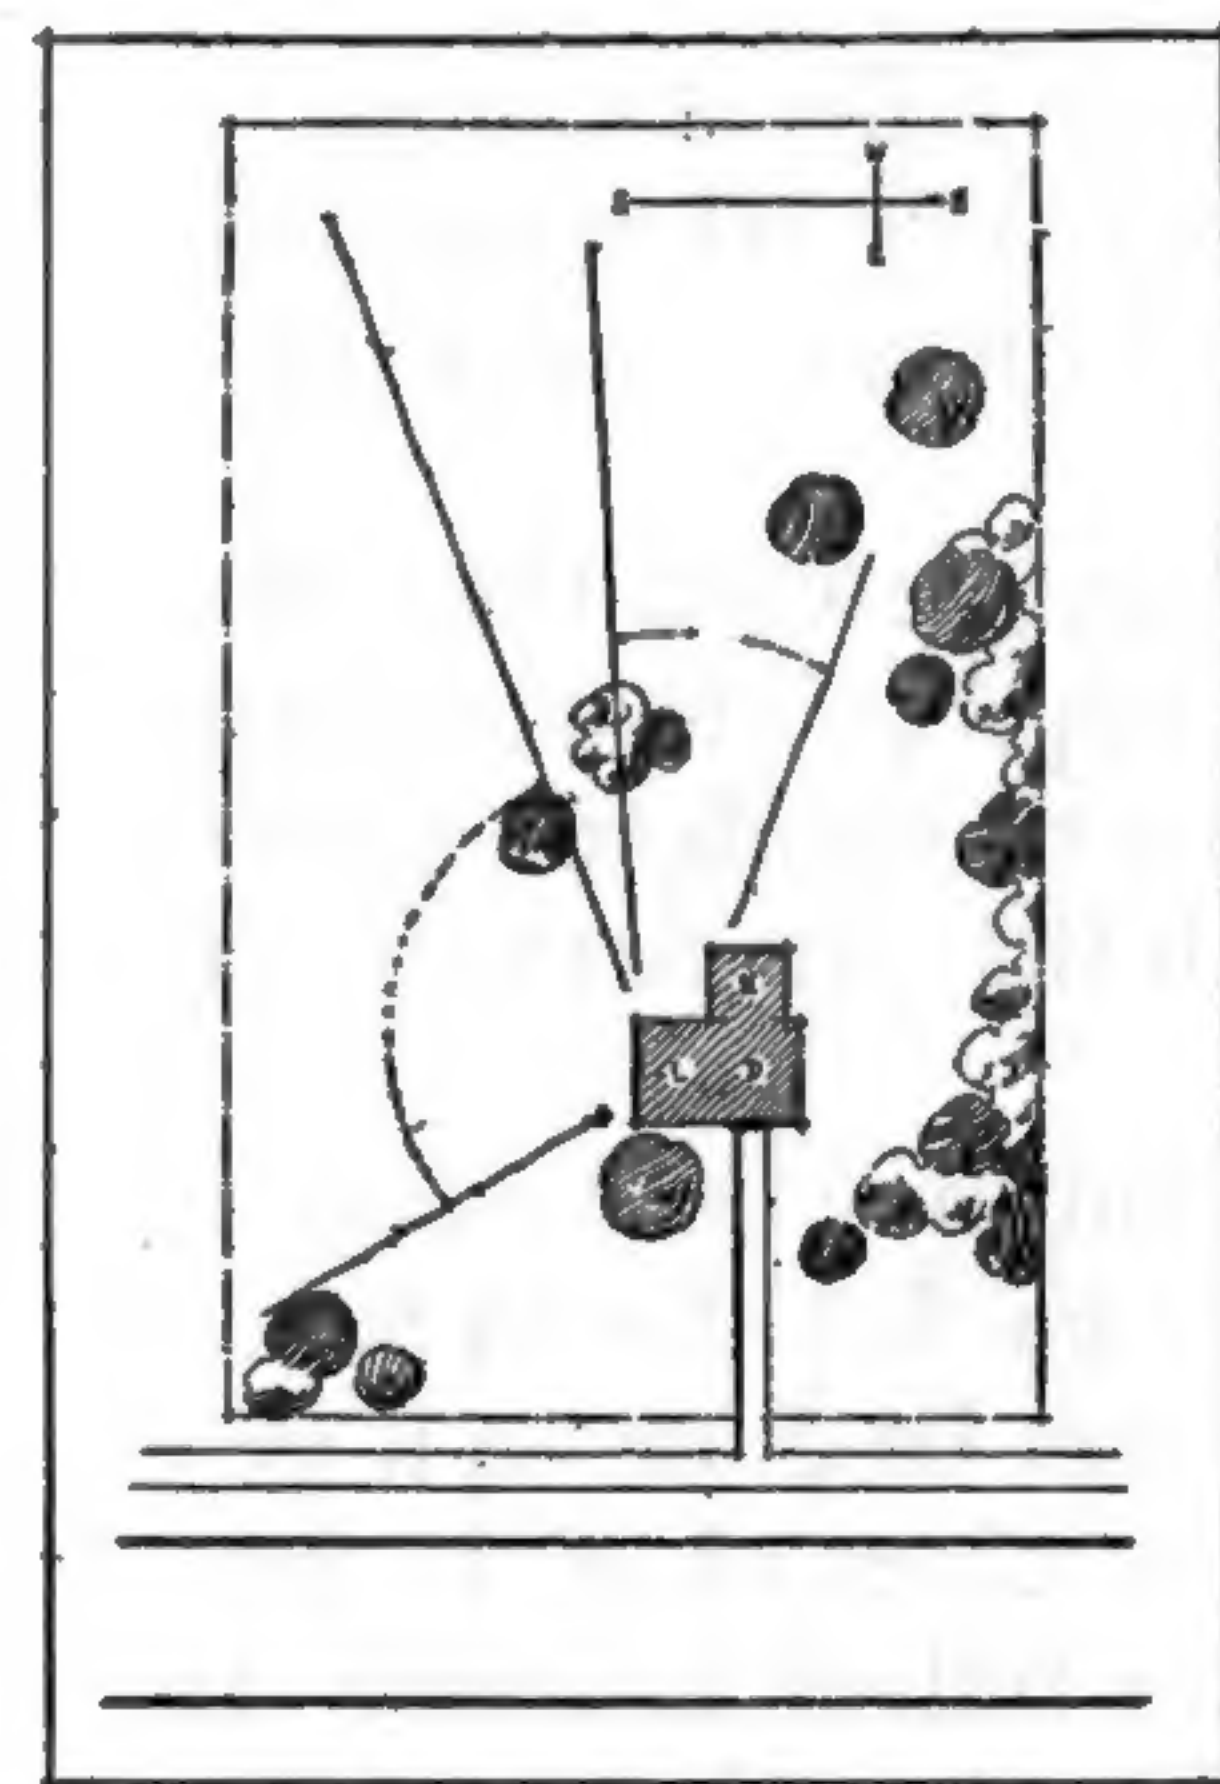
FIG. C — Planting plan to insure best effect of shade, outlook, protection and privacy on a lot facing east
